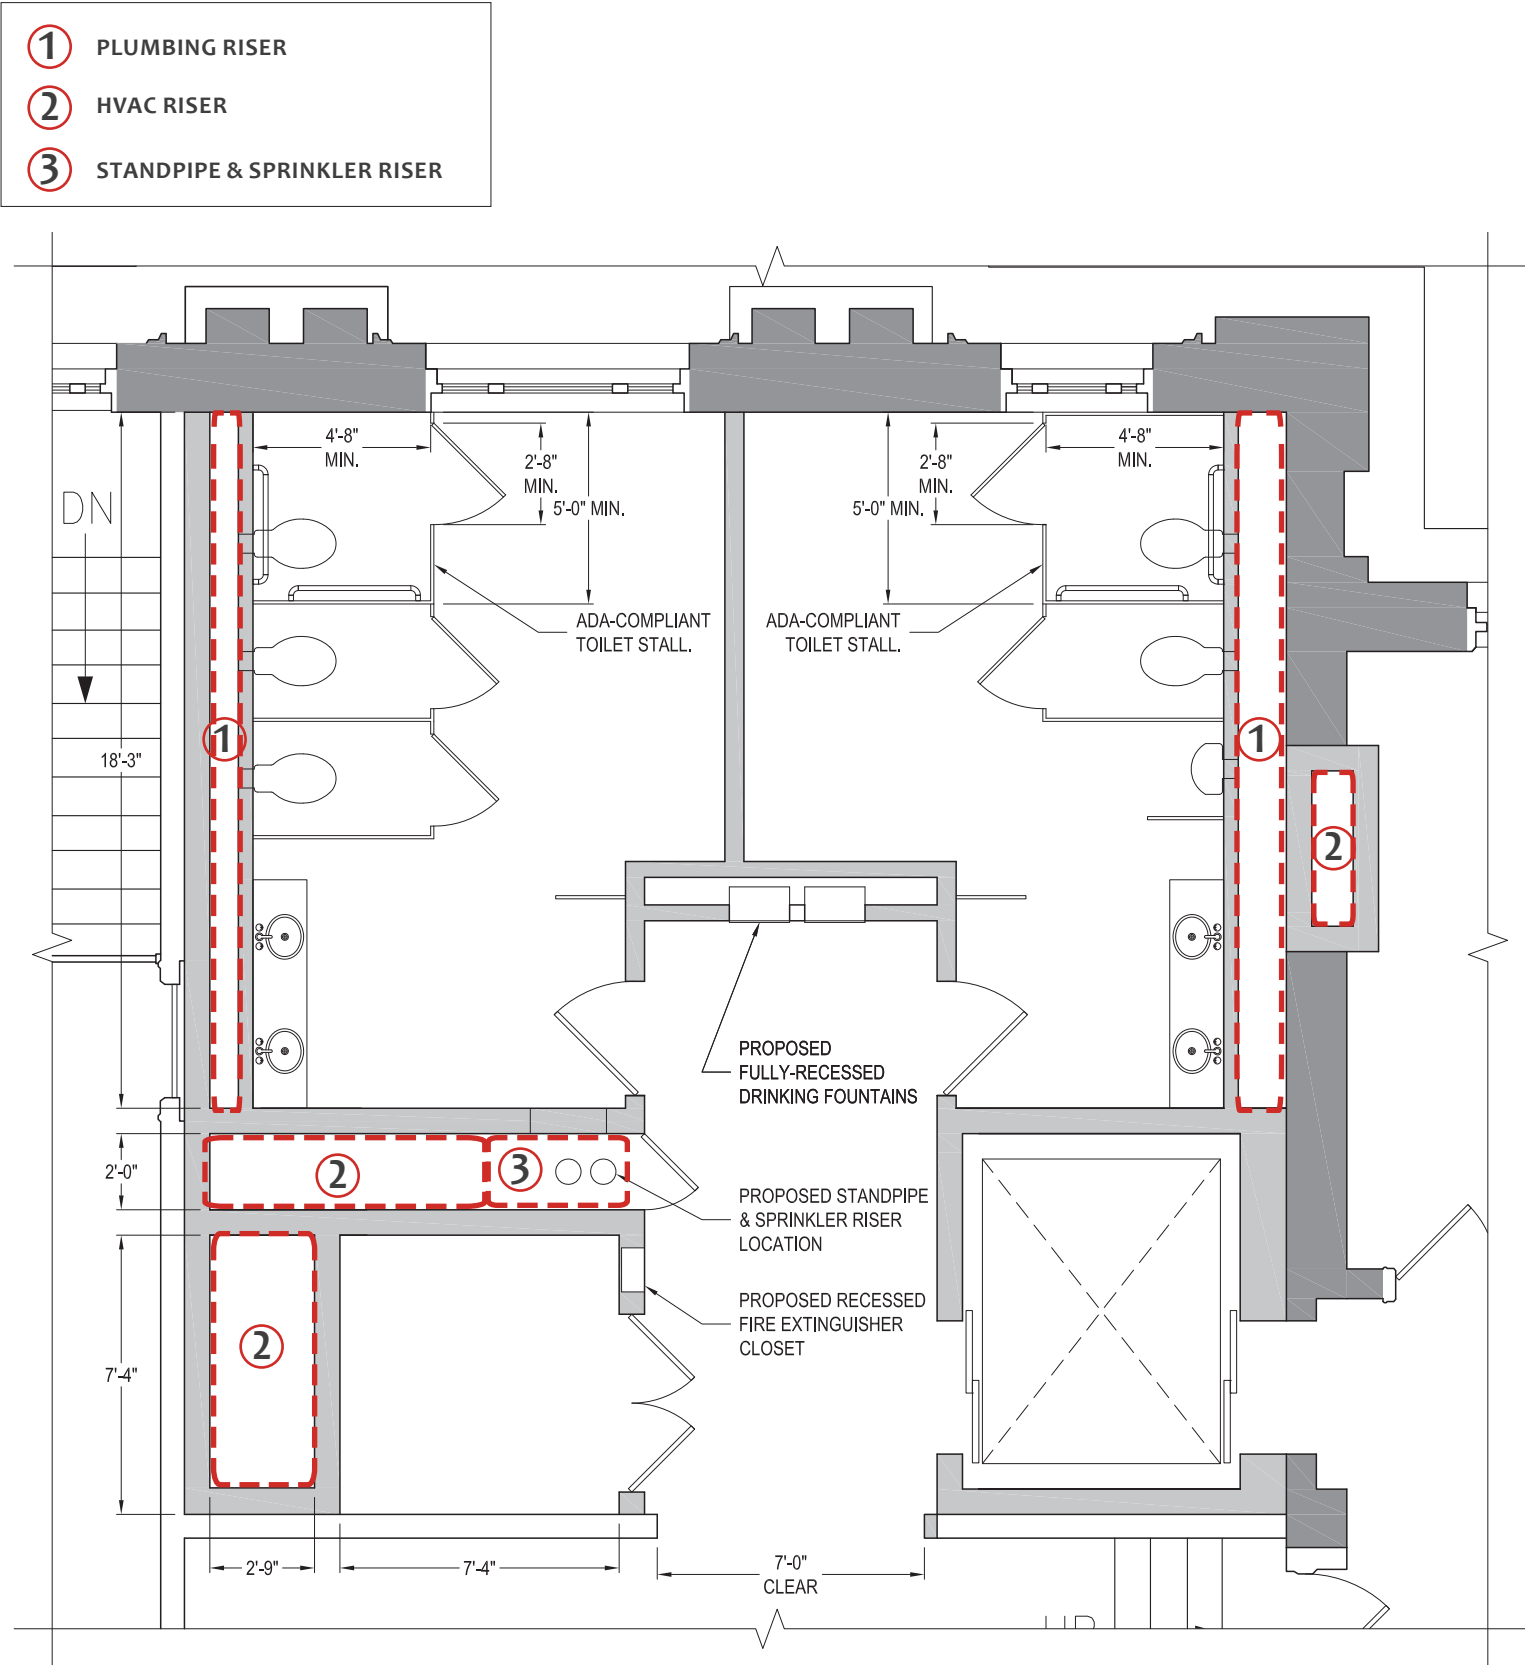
Third Floor Level [West] Proposed Service Core.
